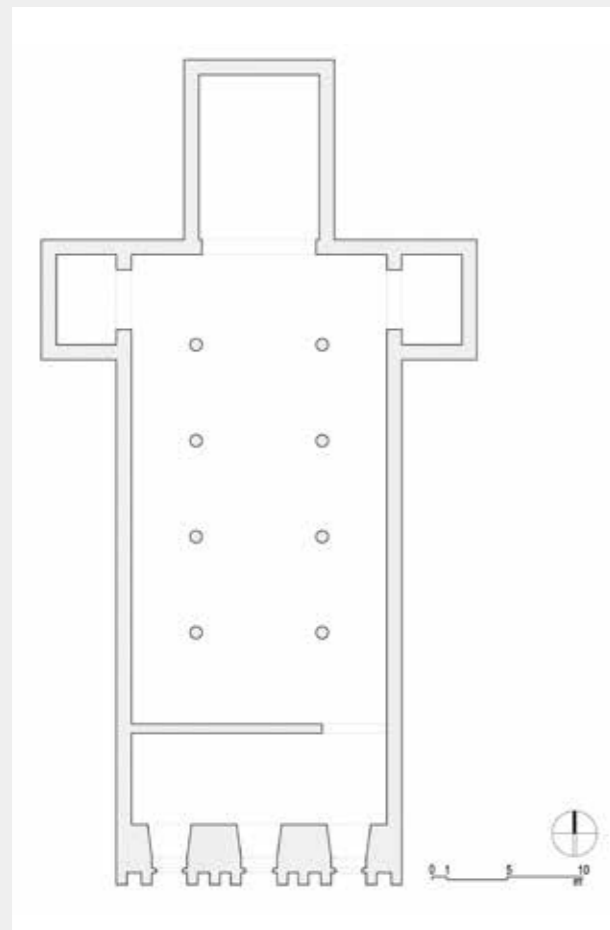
Plan of the São Paulo's Church. Artwork by Arch. Cavaterra Fabio
